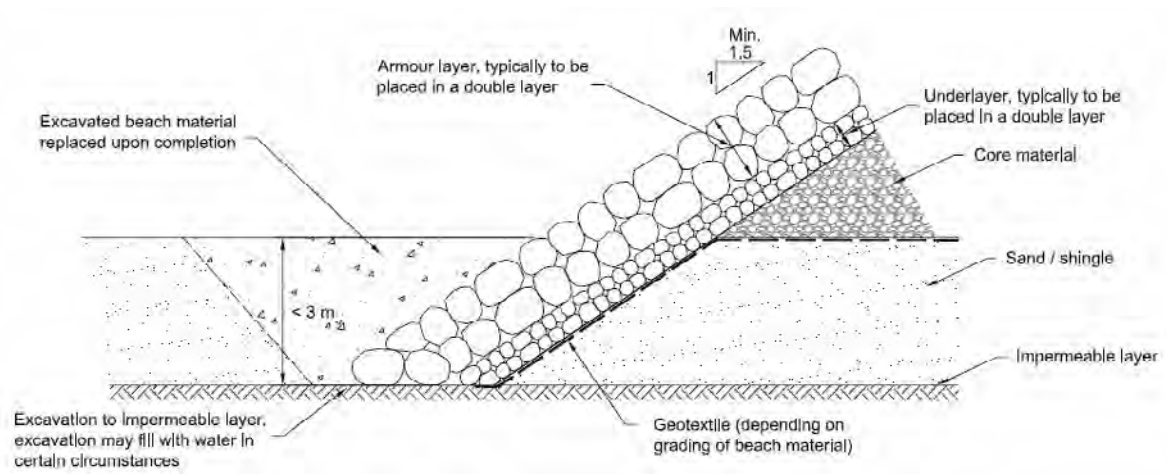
Cross-section of a Typical Rock Revetment Seawall (CIRIA, 2007)
